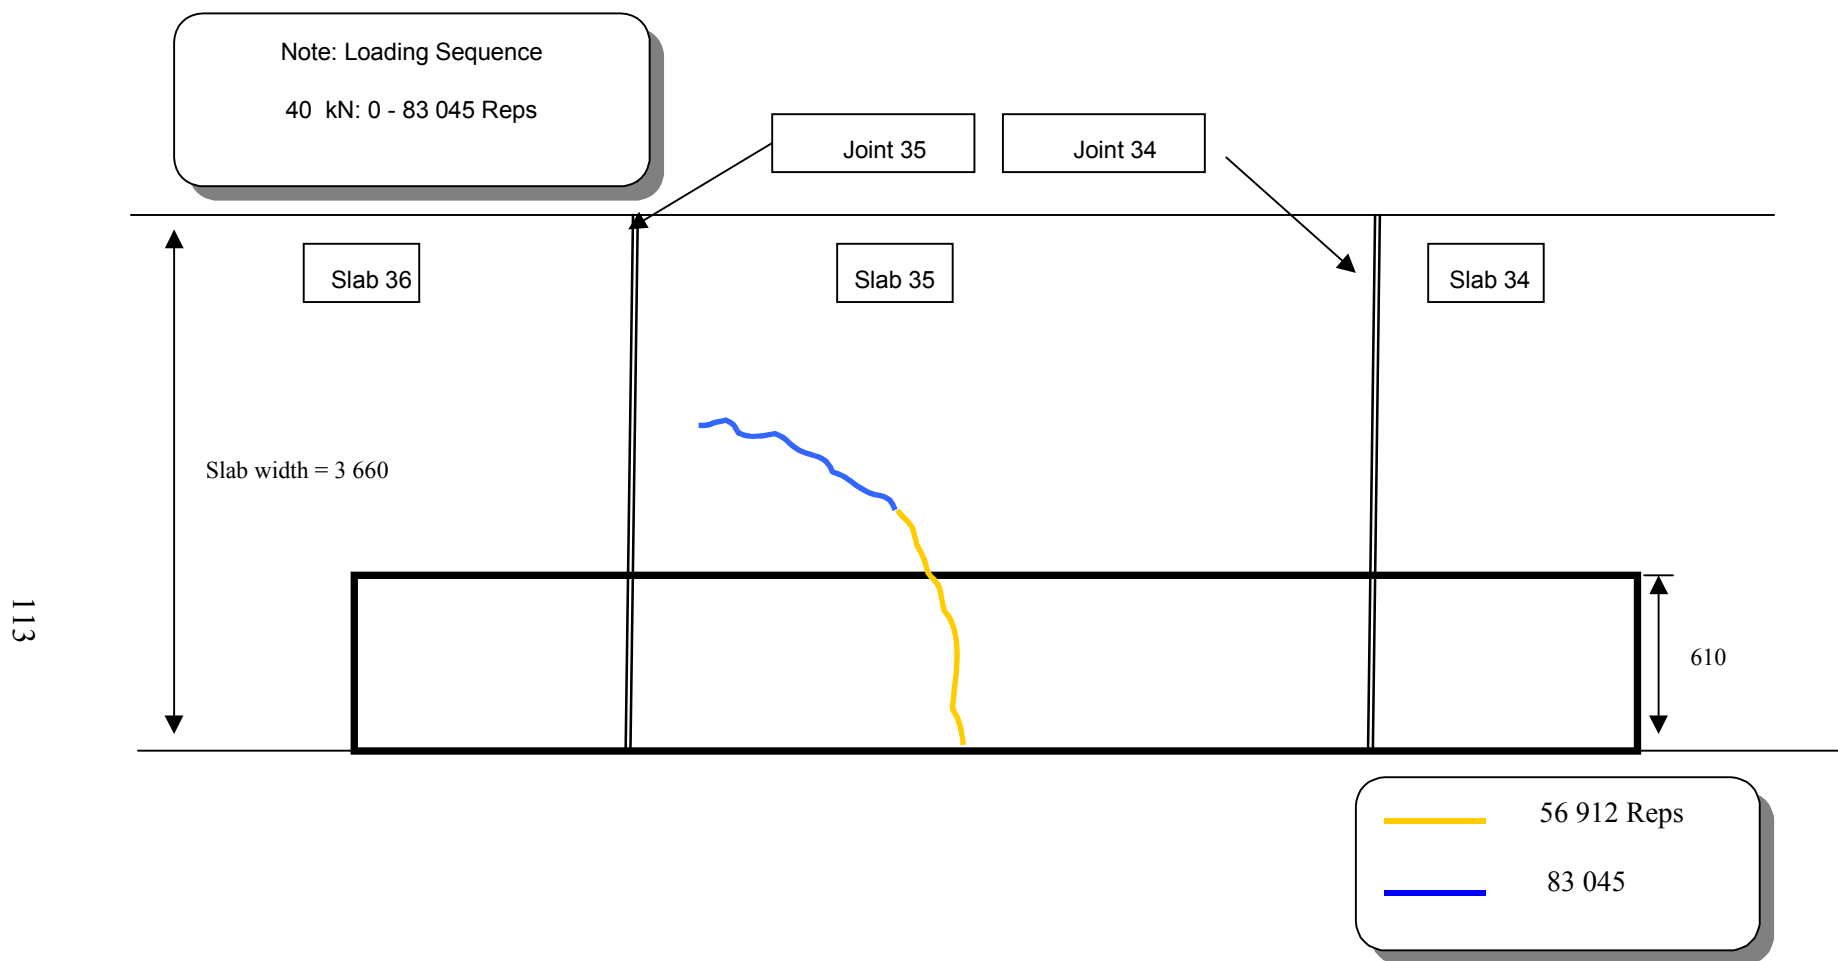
Schematic of crack development, Test Section 528FD (not to scale).
